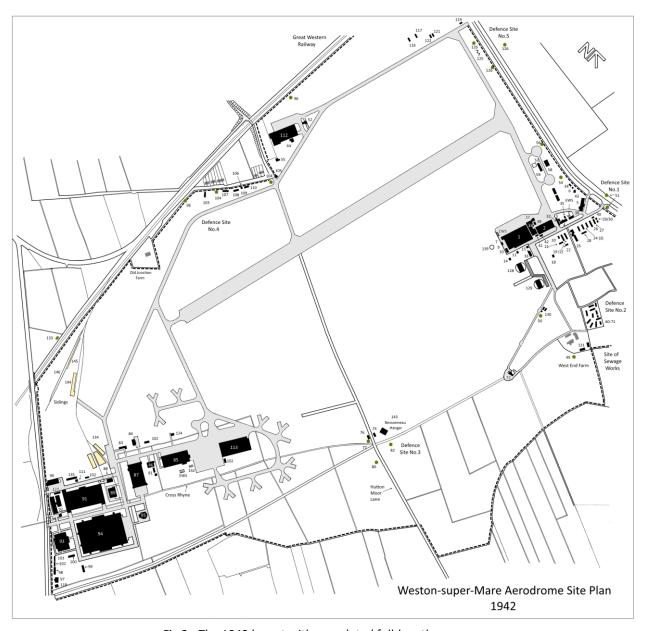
The 1942 layout with completed full-length runway See Appendix 1 for building descriptions
